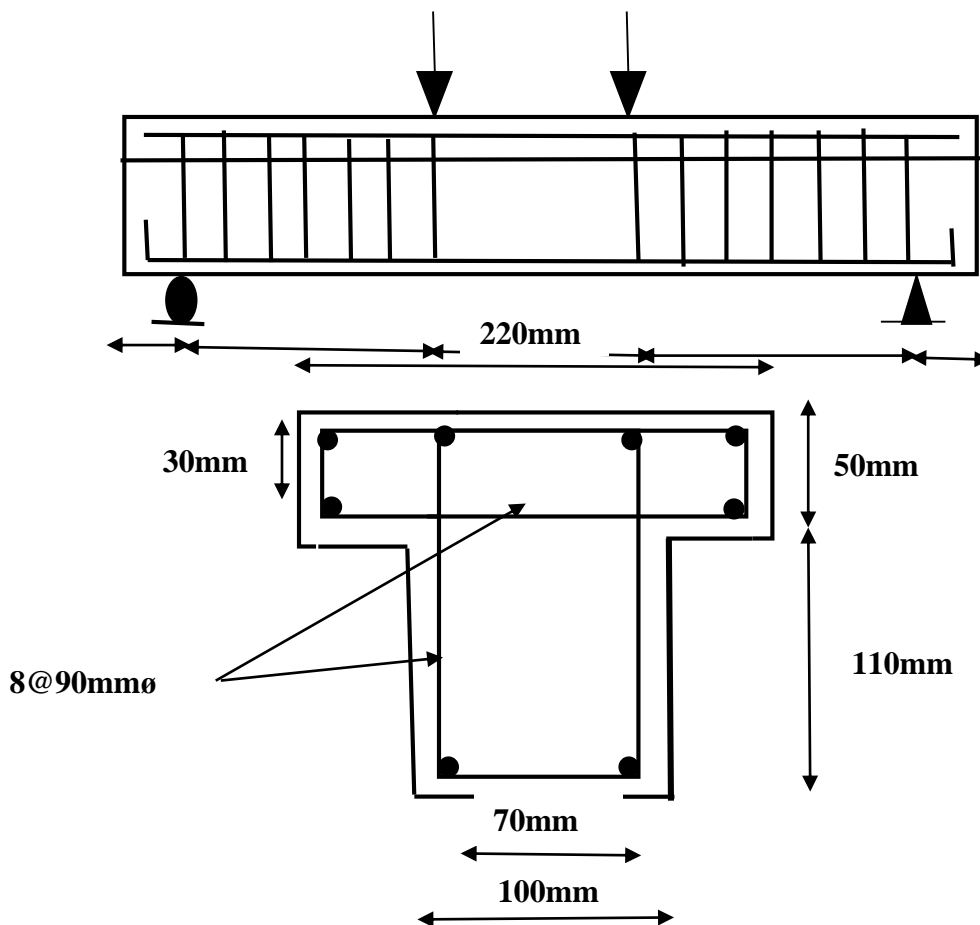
Details of cross-sectional dimensions and reinforcement of beams (Normal, RPC1, RPC2 and RPC3).
